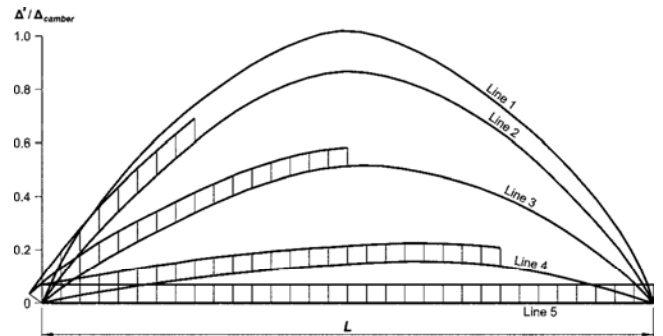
Typical deflection characteristics of beam at various stages of loading by a screed traveling longitudinally; blocking indicates applied load (concrete placed).
